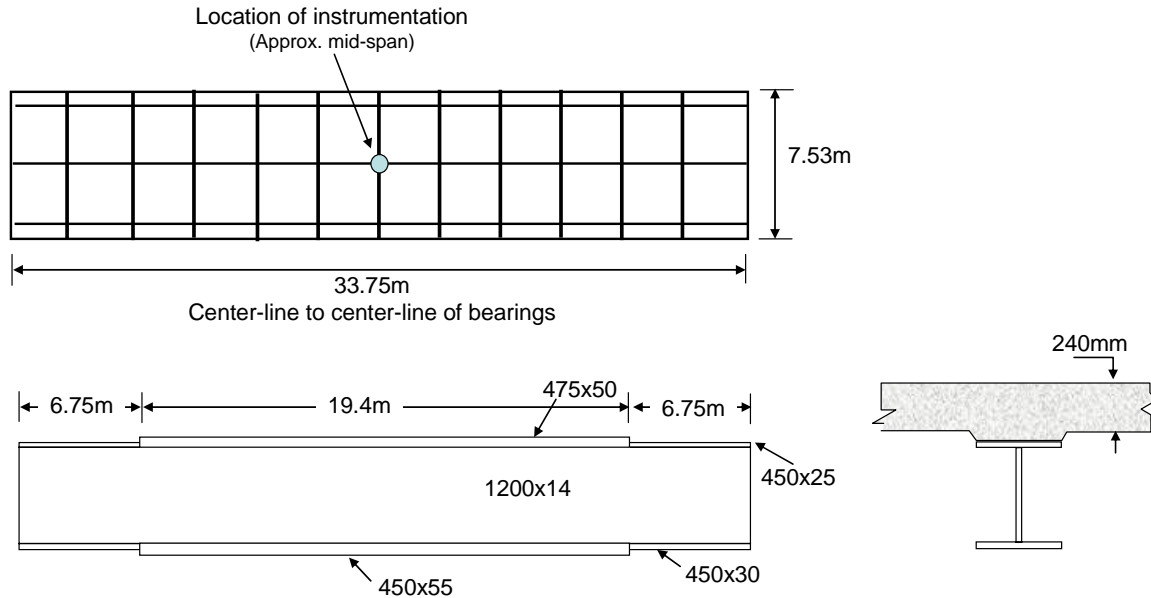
Plan view of the bridge deck slab, elevation of the steel girder and the cross-section of the composite bridge section.
